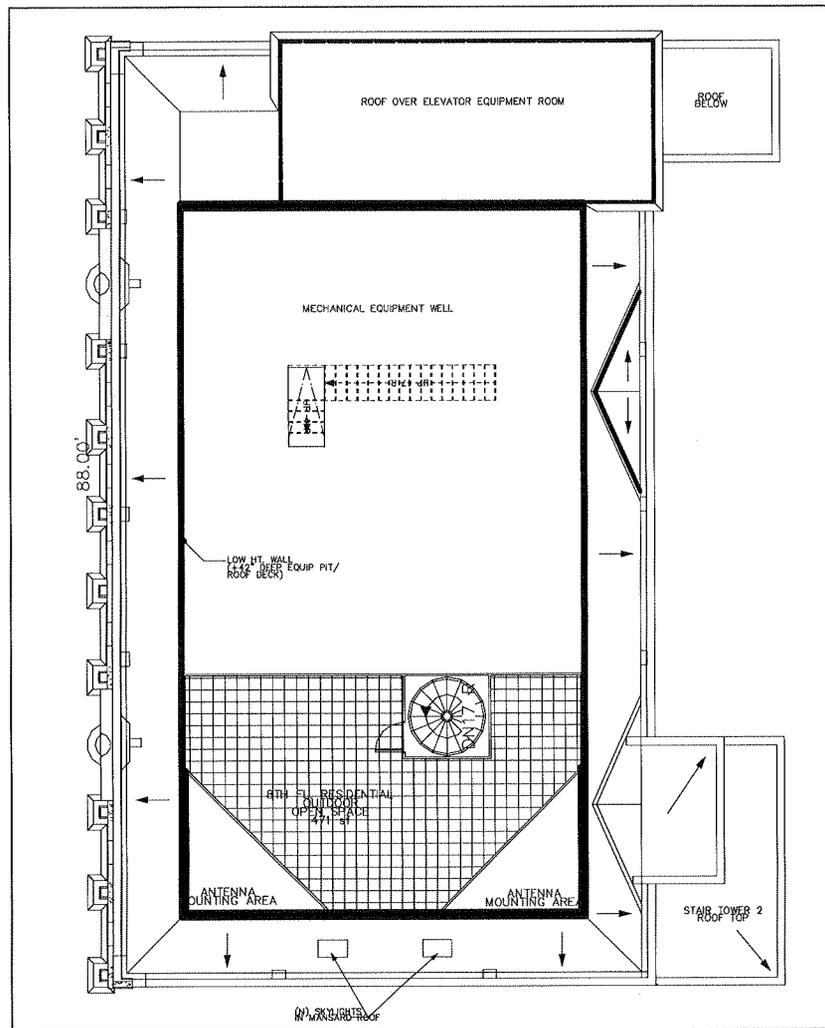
Roof Plan Showing Outdoor Living Space for Floor 8
